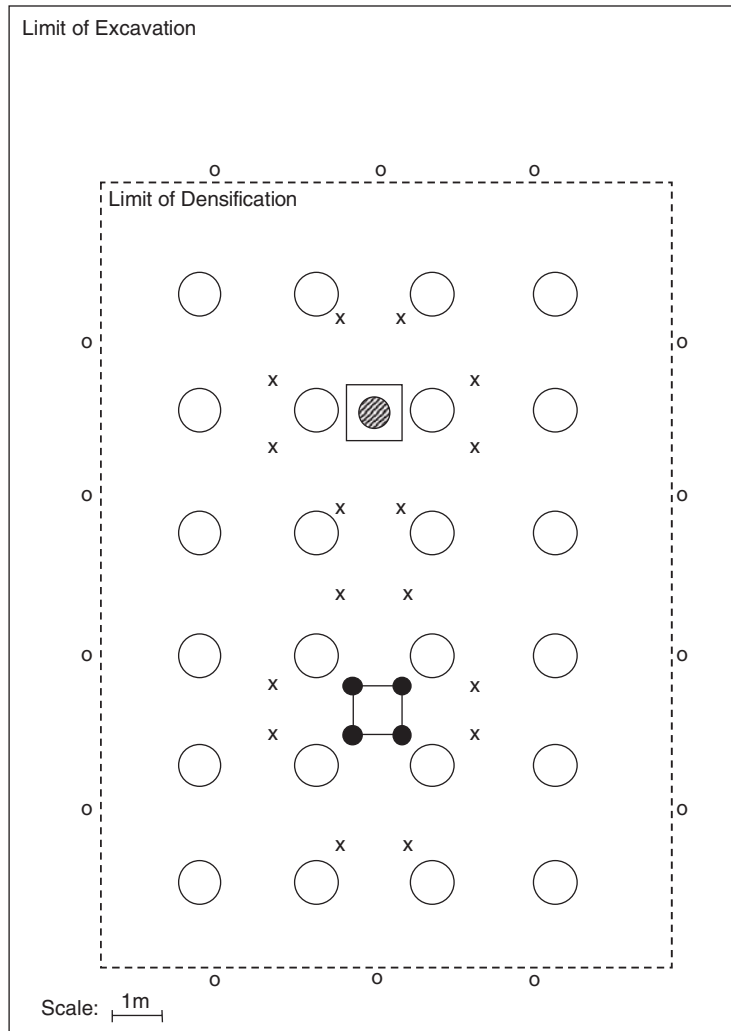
Layout of test foundations, stone columns, and explosive charges.
